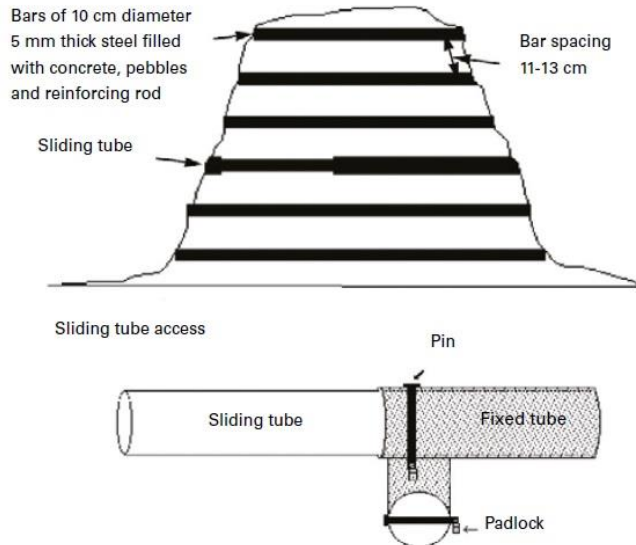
Grille design used in France. The tubes are filled with pebbles, steel and cement, which provide good resistance to cutting.
